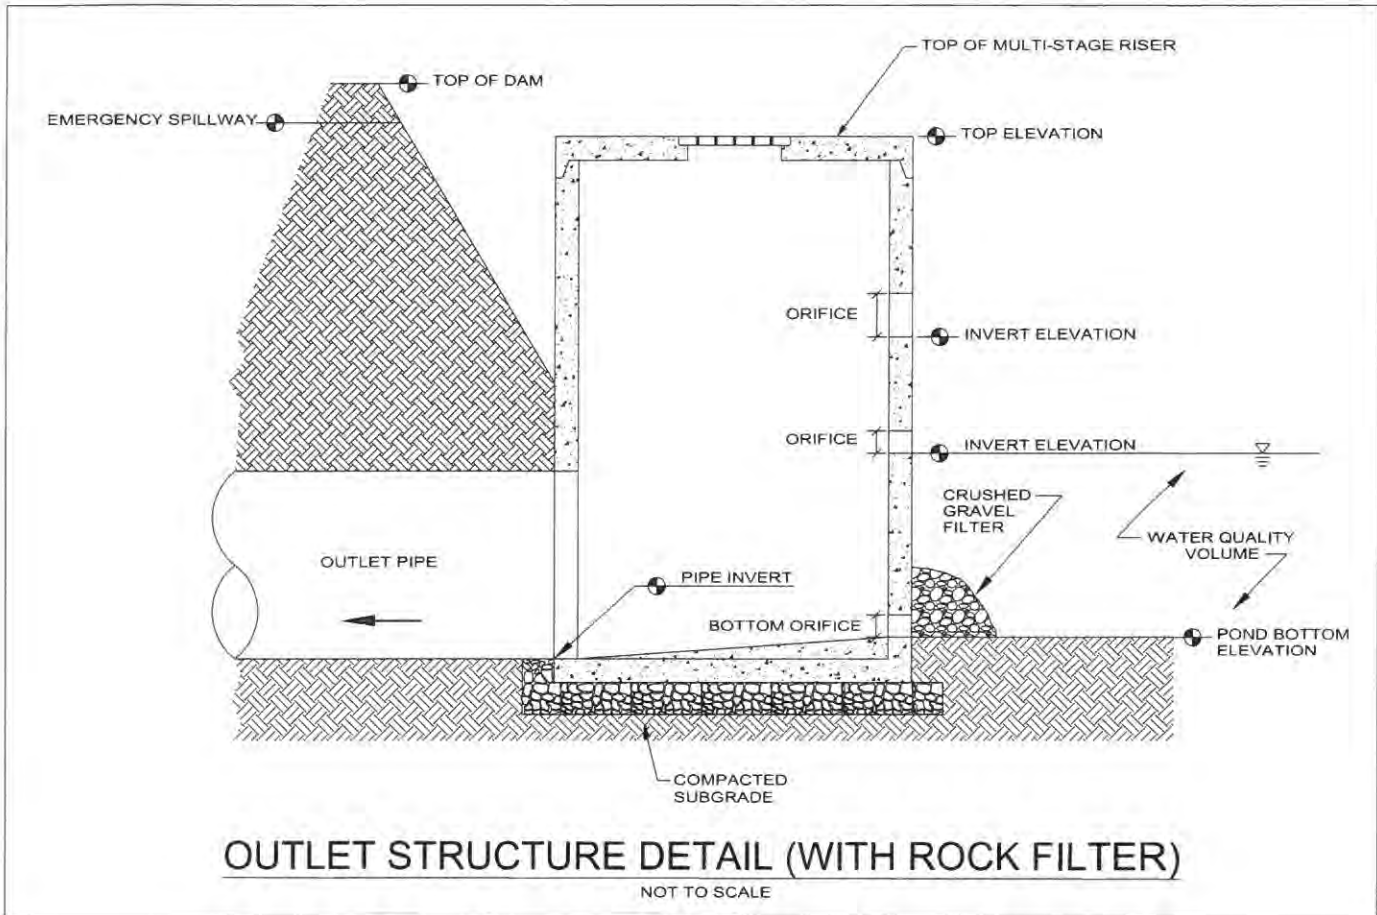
DETENTION POND OUTLET STRUCTURE EXAMPLE
